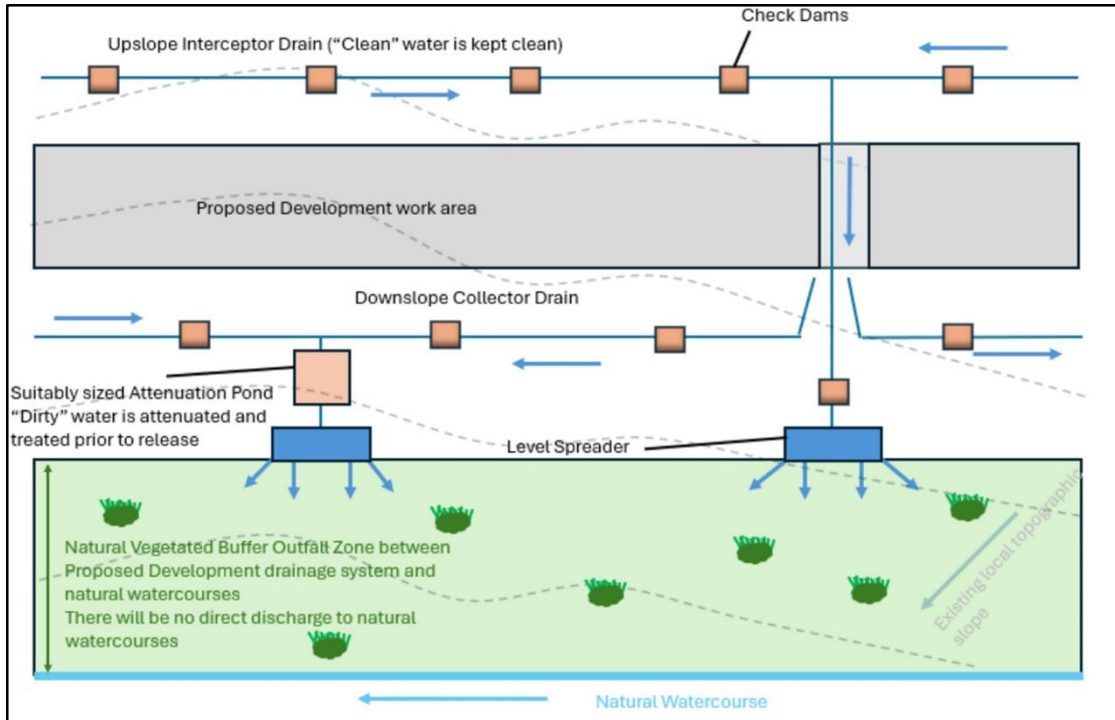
Schematic of Proposed Wind Farm Drainage Design
